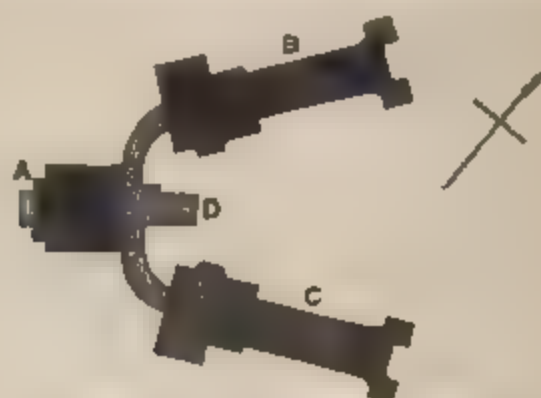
GENERAL PLAN OF SWANSEA NEW HOSPITAL.
